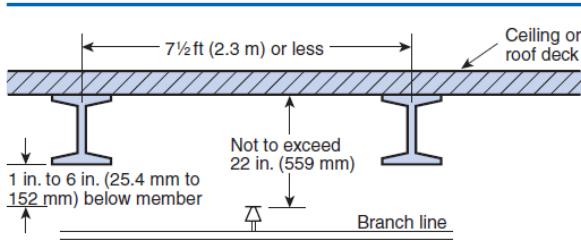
Placement of Standard Spray Upright Sprinklers Underneath Obstructed Construction.
